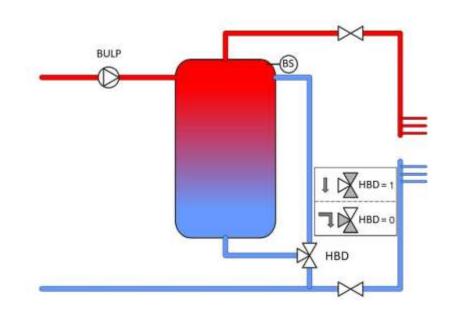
Example hydraulic scheme, Hydraulic buffer discharge HBD
